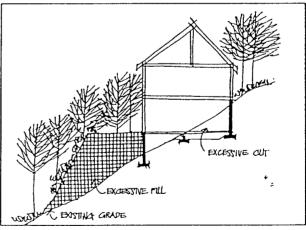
NO Buildings shall not be designed with extensive cut or fill.
